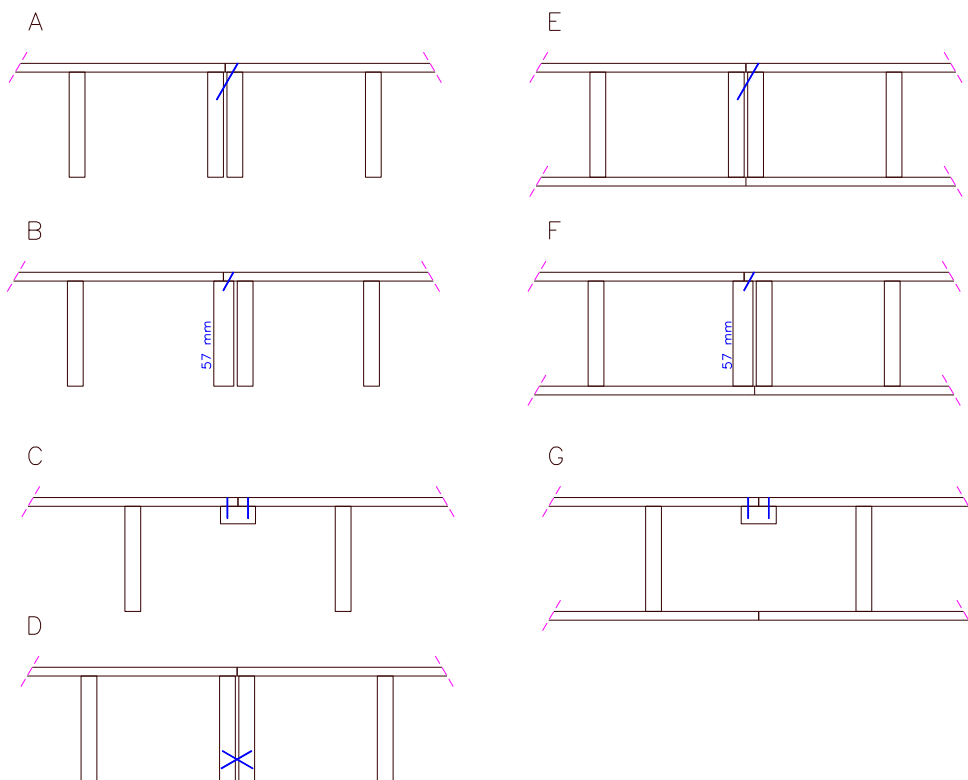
Principal drawing of connections between EGO RIPA Elements.
